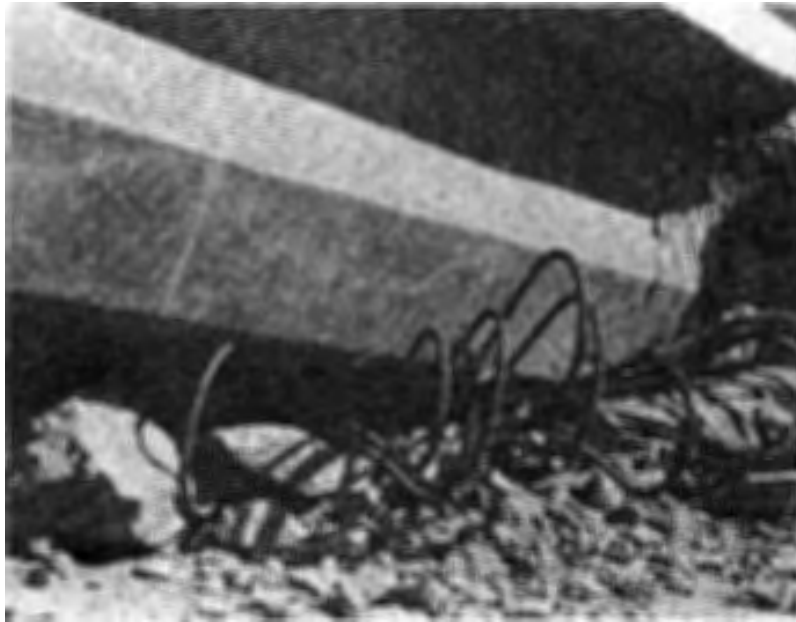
Route 5 (Truck Lane)/405 Separation. Remains of shattered south column of two-column bent. Note buckled vertical reinforcing bars. California Division of Highways, Bridge Department photograph.
